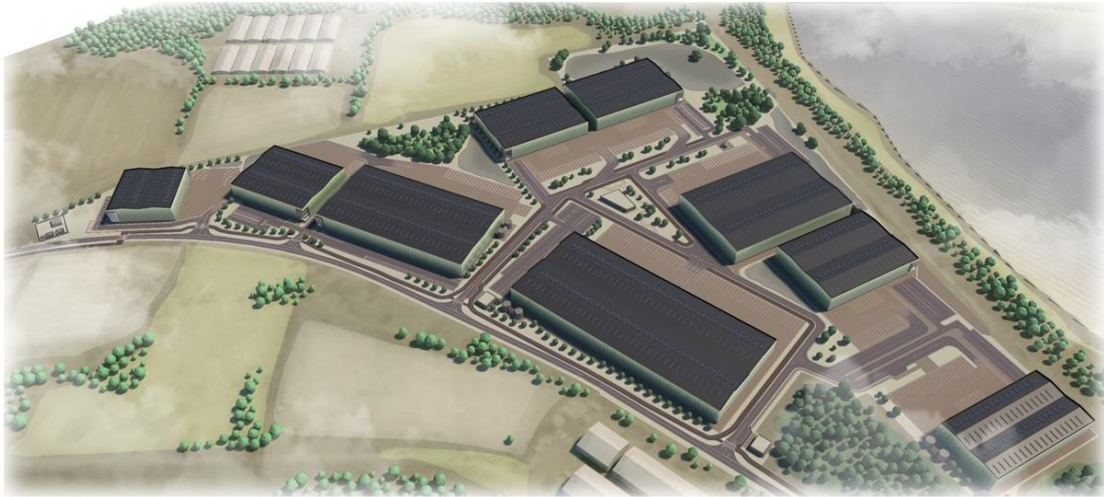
Aerial CGI view of the indicative masterplan, looking southeast across the site
